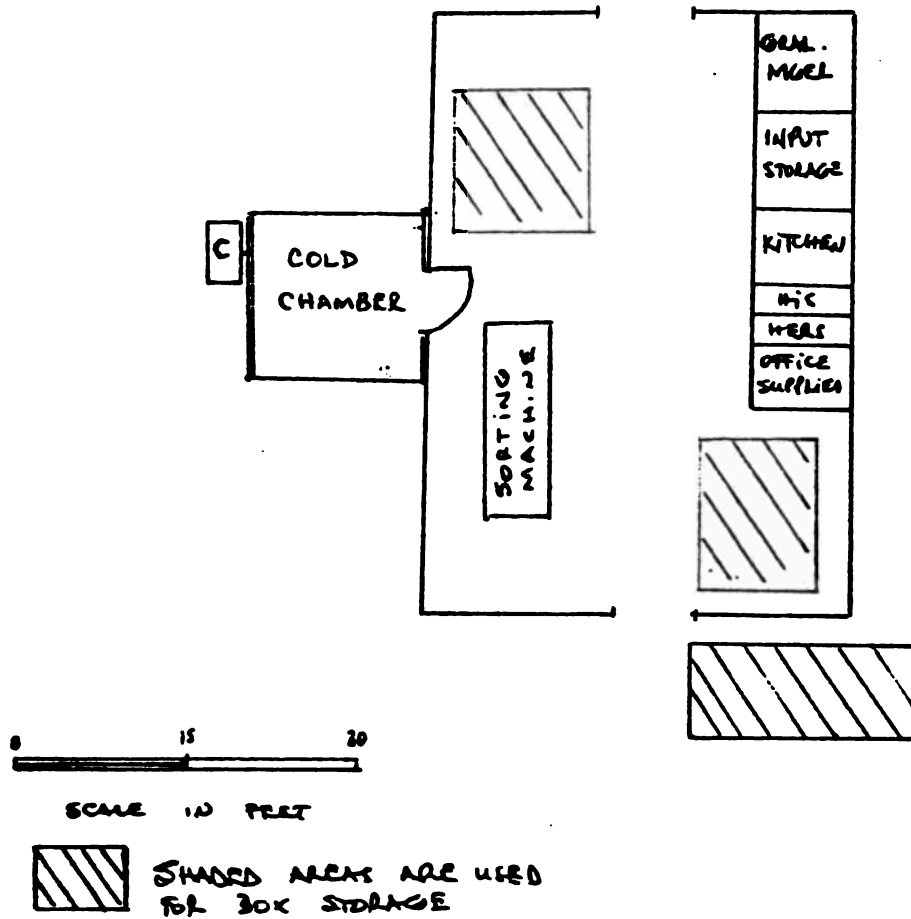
LAYOUT OF NORTH ANDROS PACKING HOUSE
